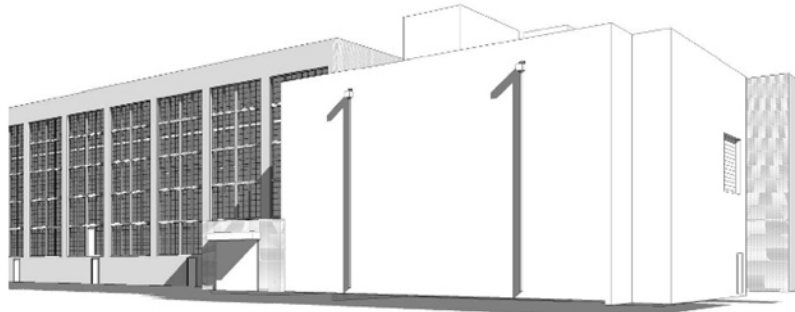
B-83 CDAML – Building Addition Rendering.
